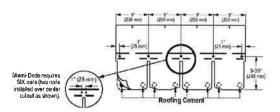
A: Use FIVE nails and eight spots of asphalt roofing coment under each tab corner.
